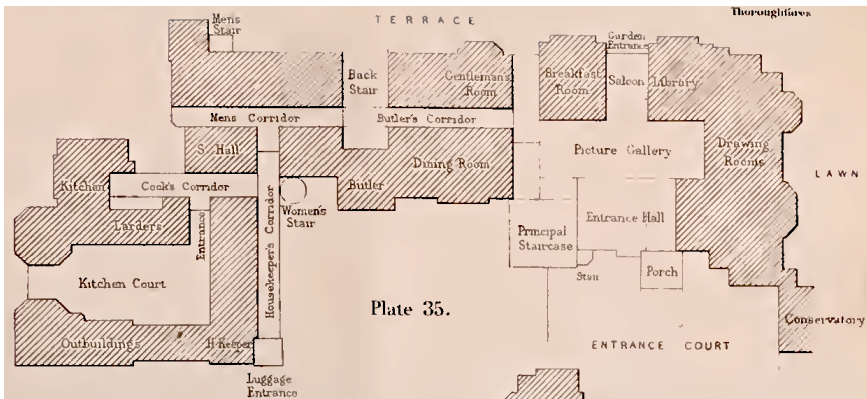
Robert Kerr, Bearwood, Berkshire, 1865–74, floor plan showing the locations of corridors, staircases, and passages. Source: Robert Kerr, *The Gentleman’s House* (London: John Murray, 1864).
